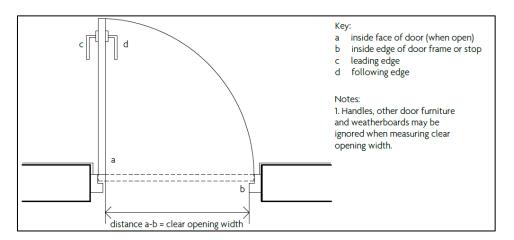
External and Internal Door Clear Opening Width Measurement
